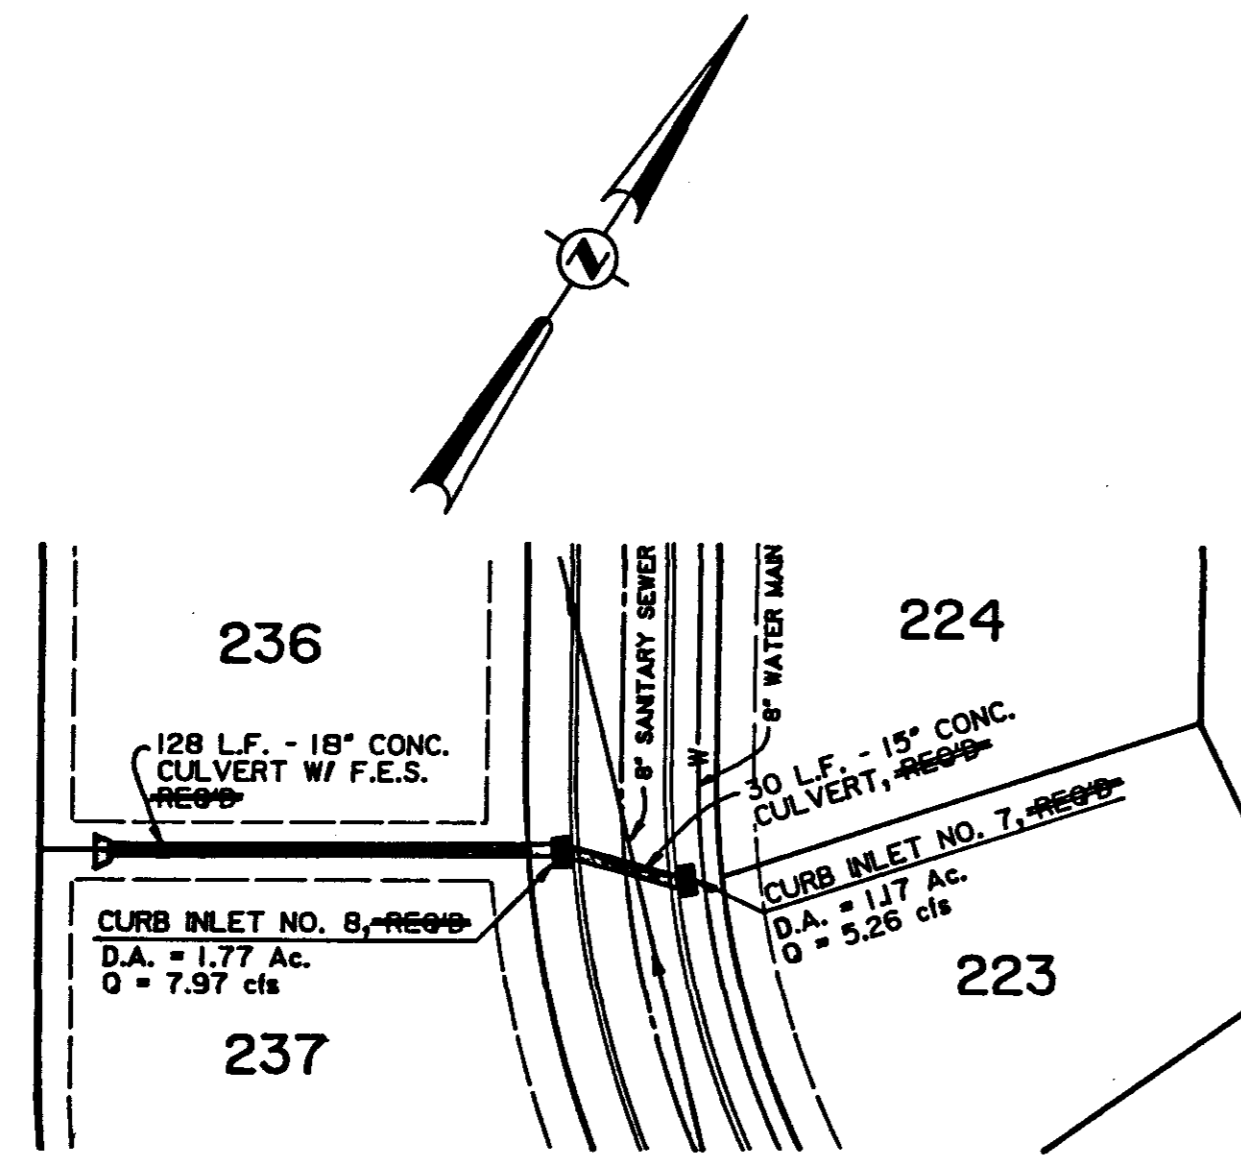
SINGLE PLAN AND PROFILE FULL DOT
